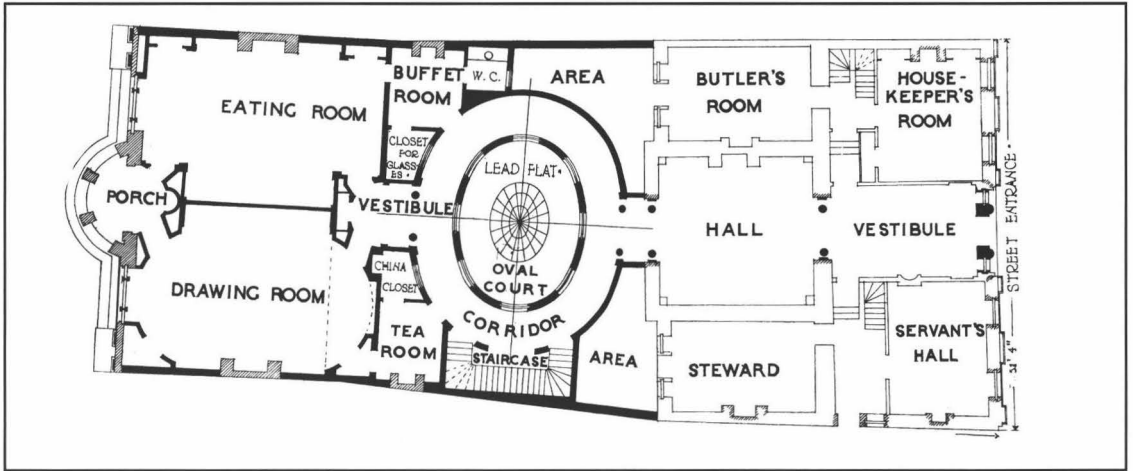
Robert Adam, ground-floor plan of Mrs Fitzherbert's house, 1787. (Source: Arthur Bolton, *The Architecture of Robert and James Adam* (1922).) The Adam addition is shown in dark outline.
